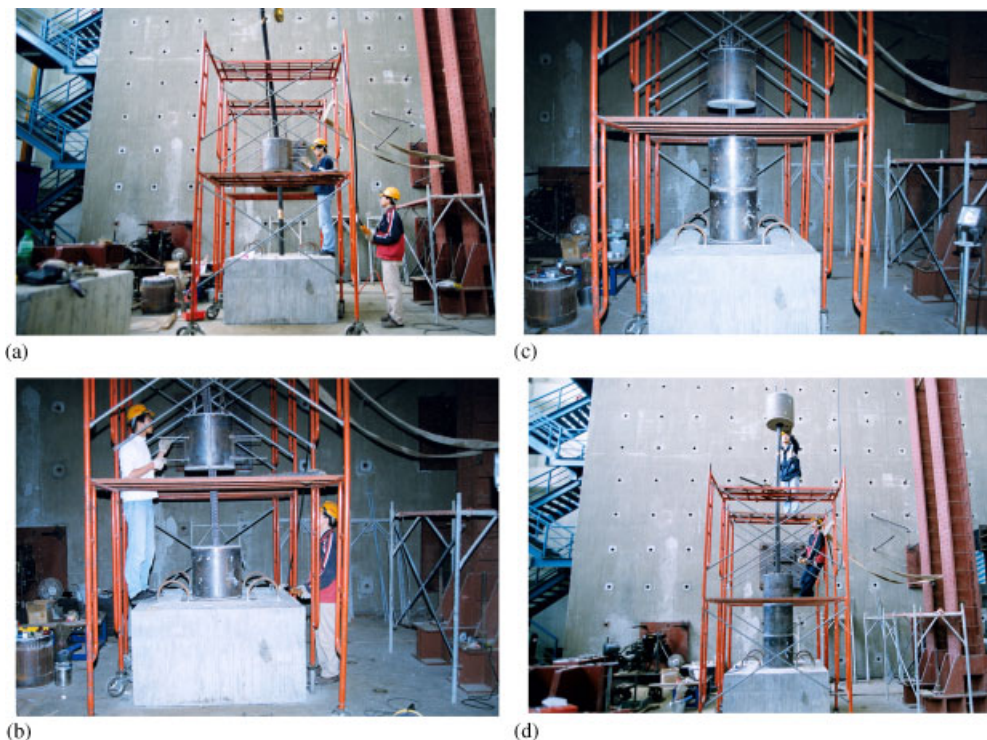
Specimen assembly sequence: (a) first segment; (b) second segment; (c) third segment; and (d) fourth segment.
